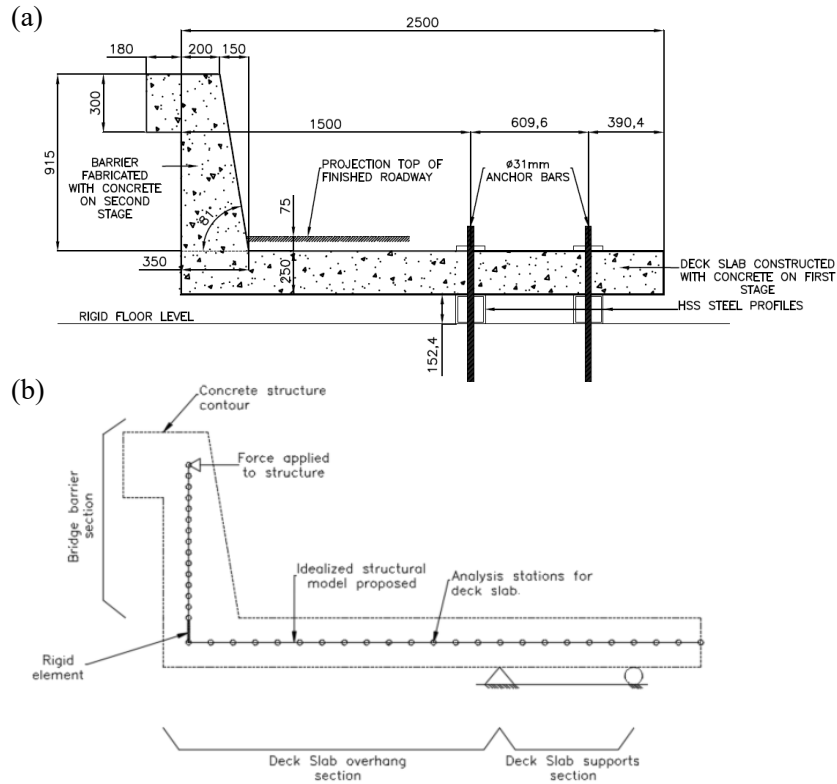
Deck-Barrier structure (a) test specimen dimensions (units of mm) and (b) idealized model.
